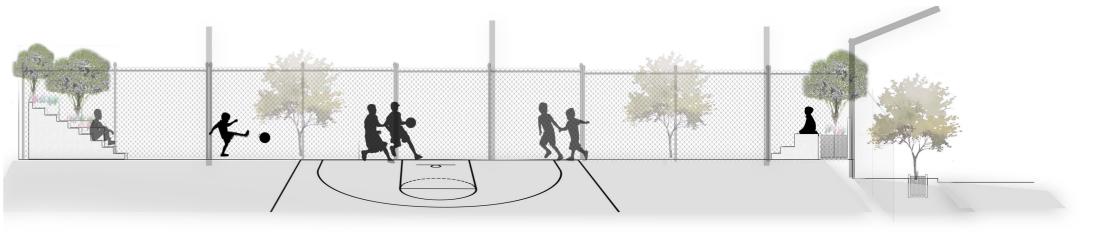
Open Space Rendered Plan / 1:200 Fig. 73 Overall Open Space Section / 1:100
